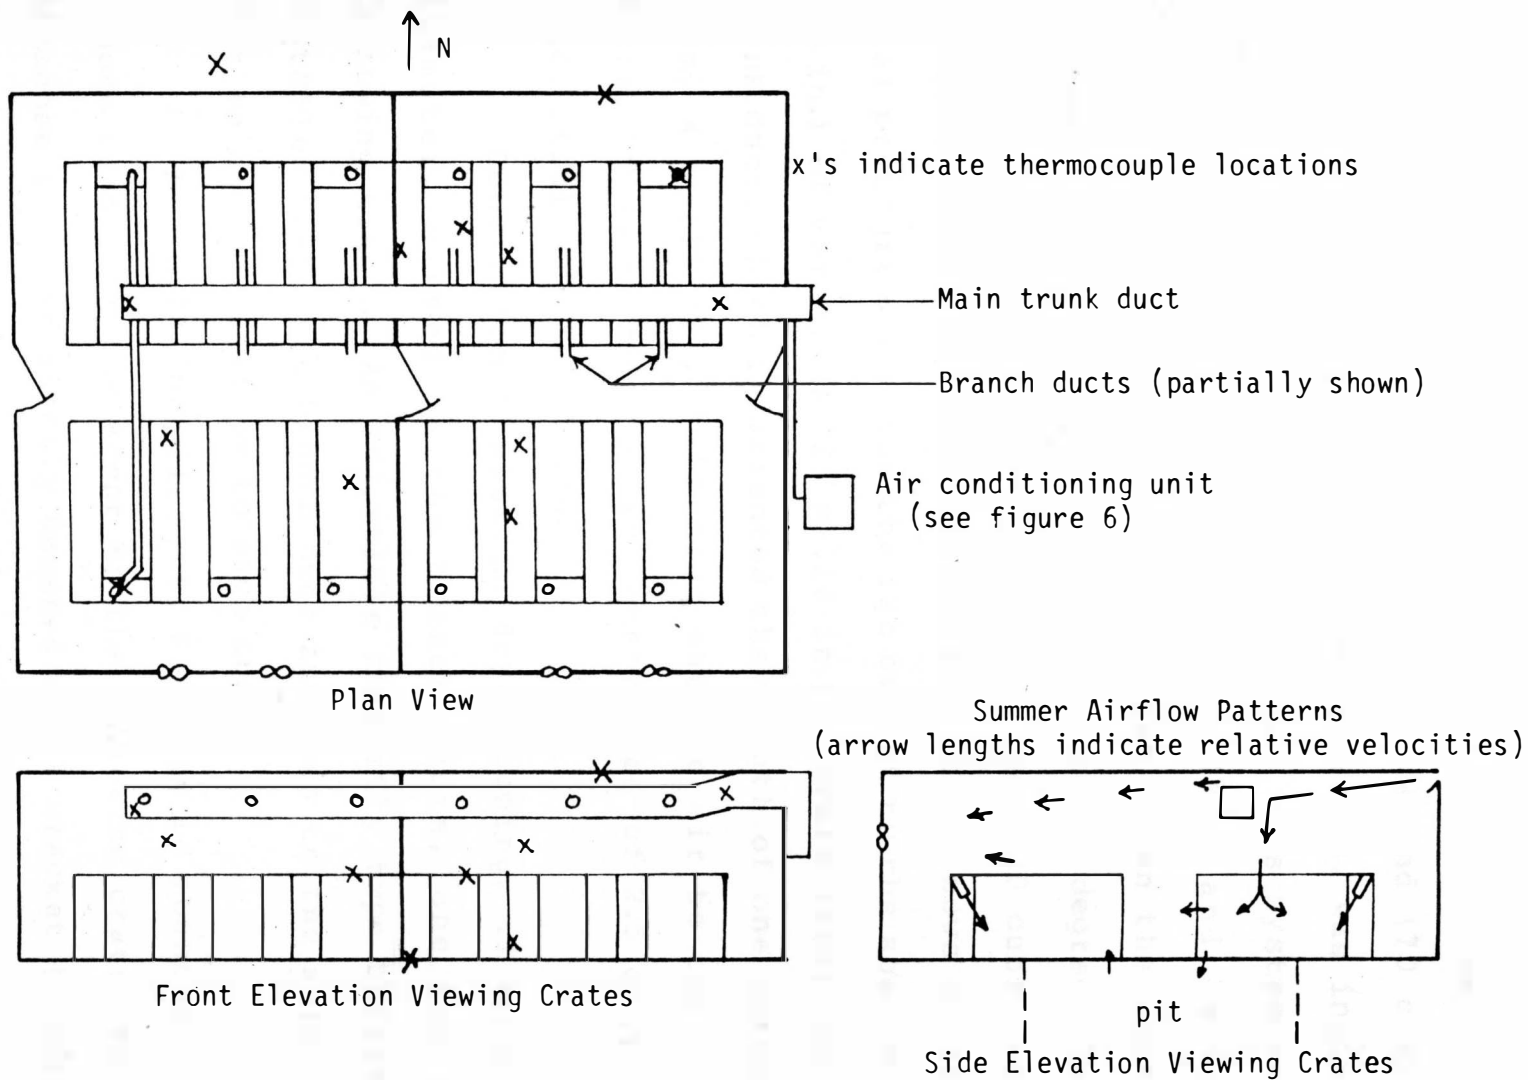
Snout cooling room schematic showing floor plans, thermocouple locations and airflow patterns
